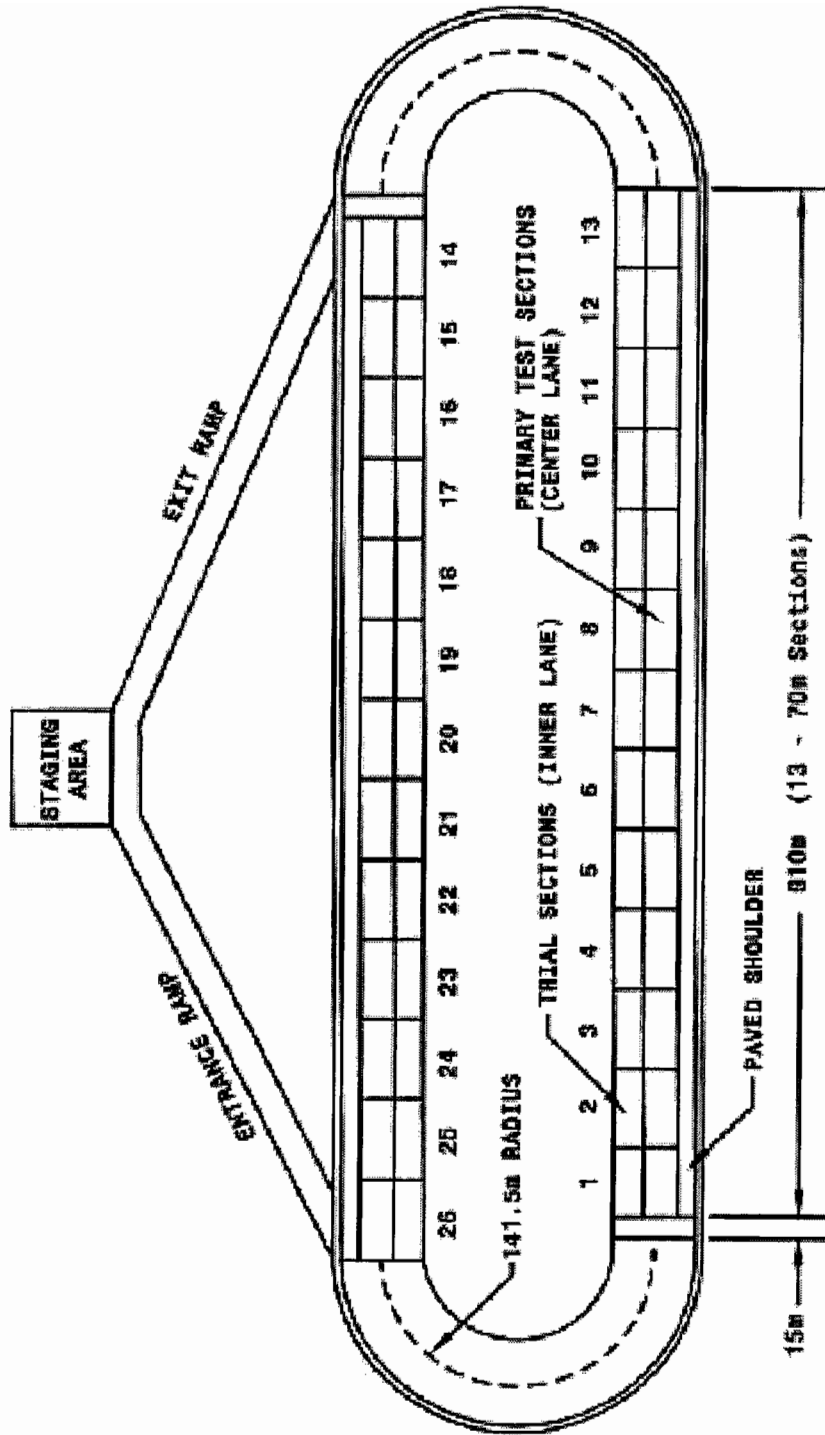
Layout of WesTrack test track (not to scale).
